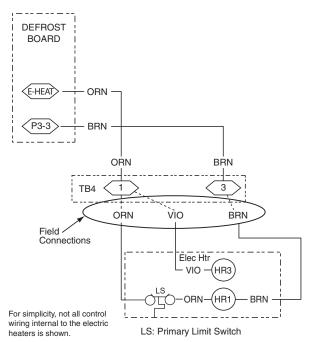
Accessory Electric Heater Control Connections for CRHEATER128B00-129B00 Only
